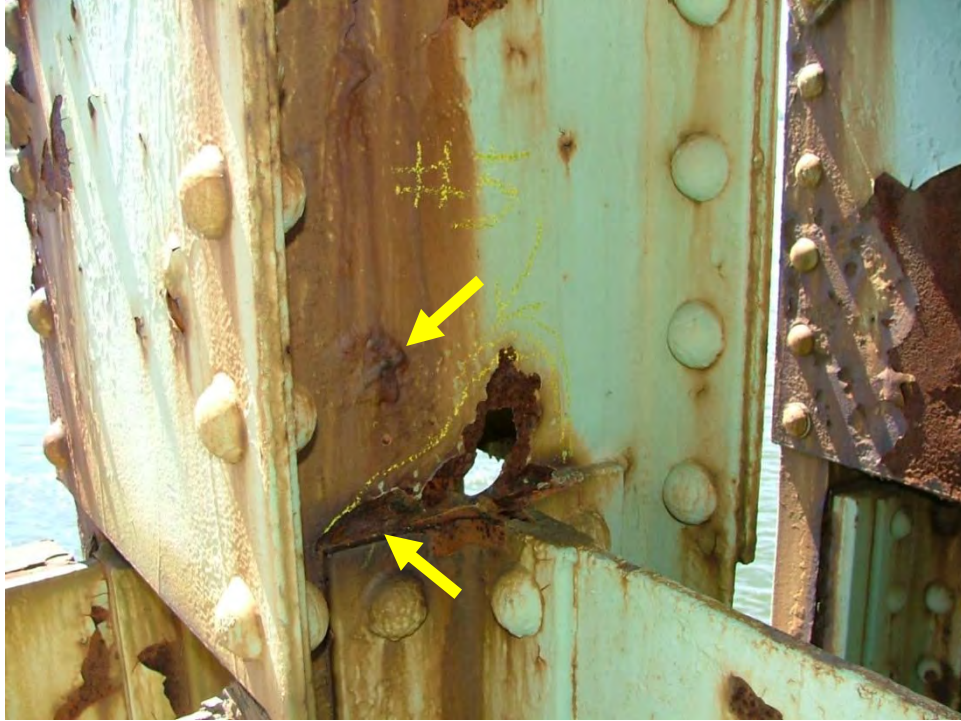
2014 Inspection – Span 8 West Member L14U14
